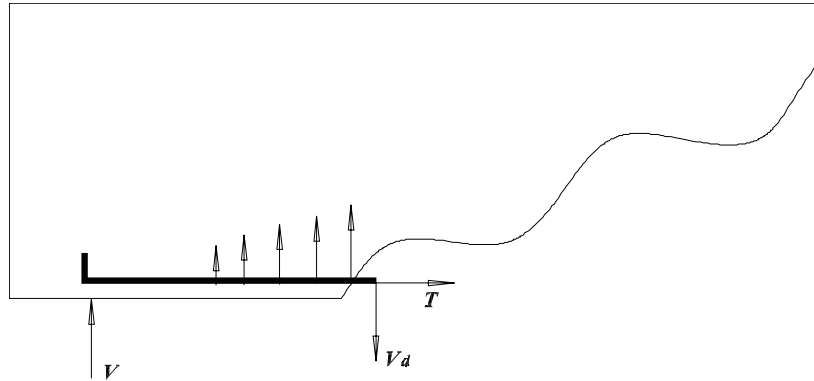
Dowel action mechanism along the cracked reinforced concrete member
